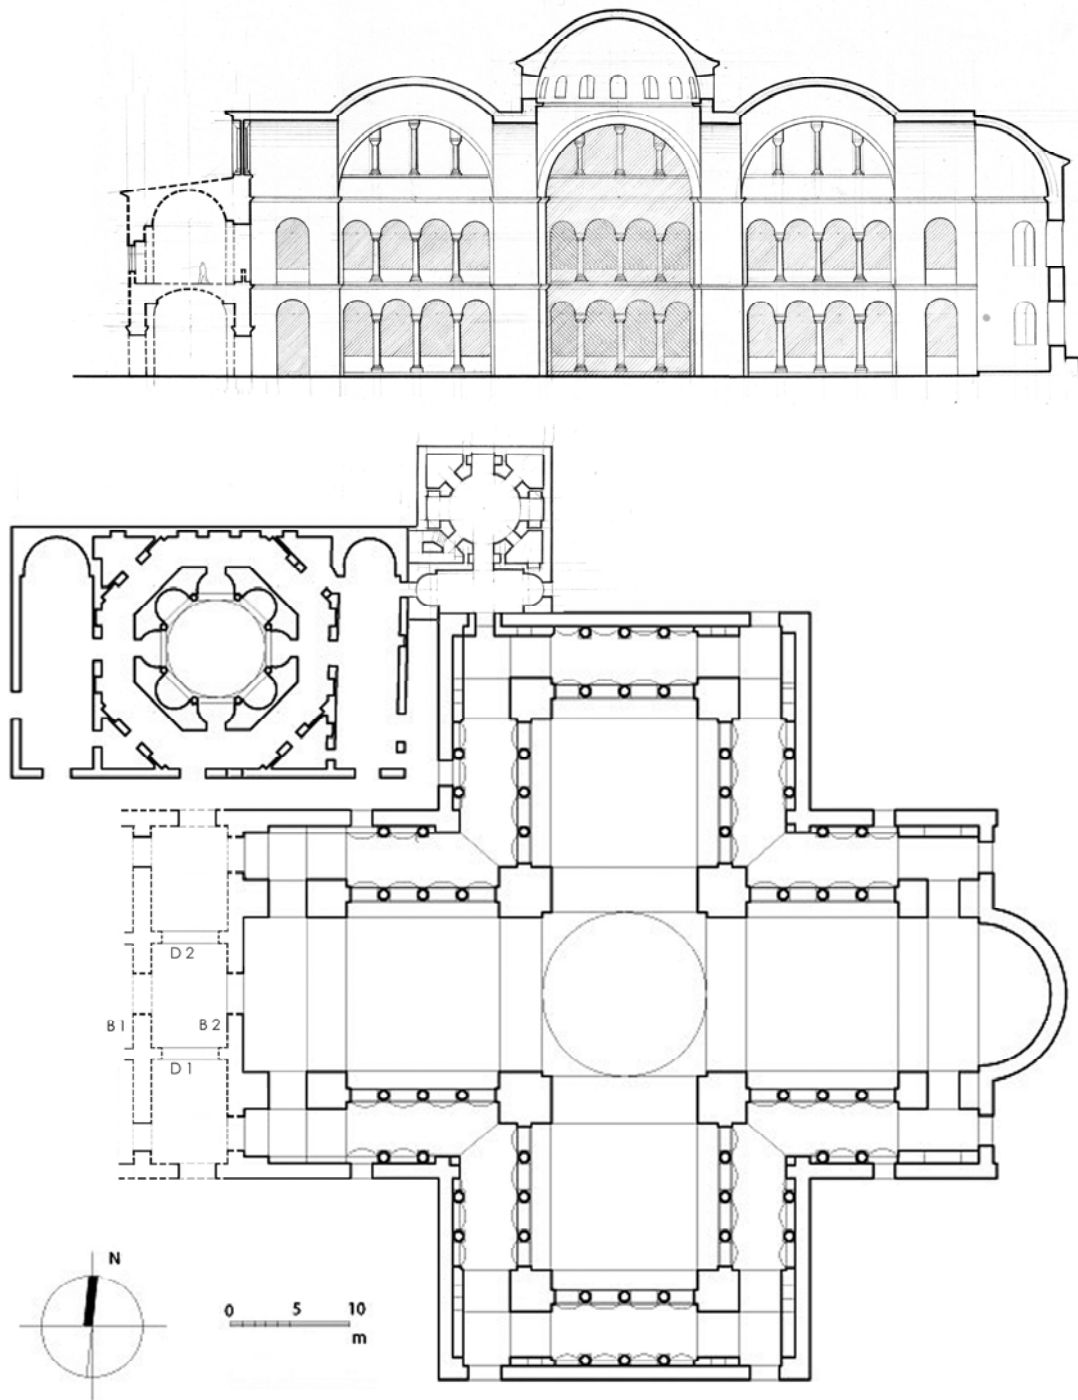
Reconstructed plan and section of the second church of St. John (Nikolaos Karydis, 2013).
